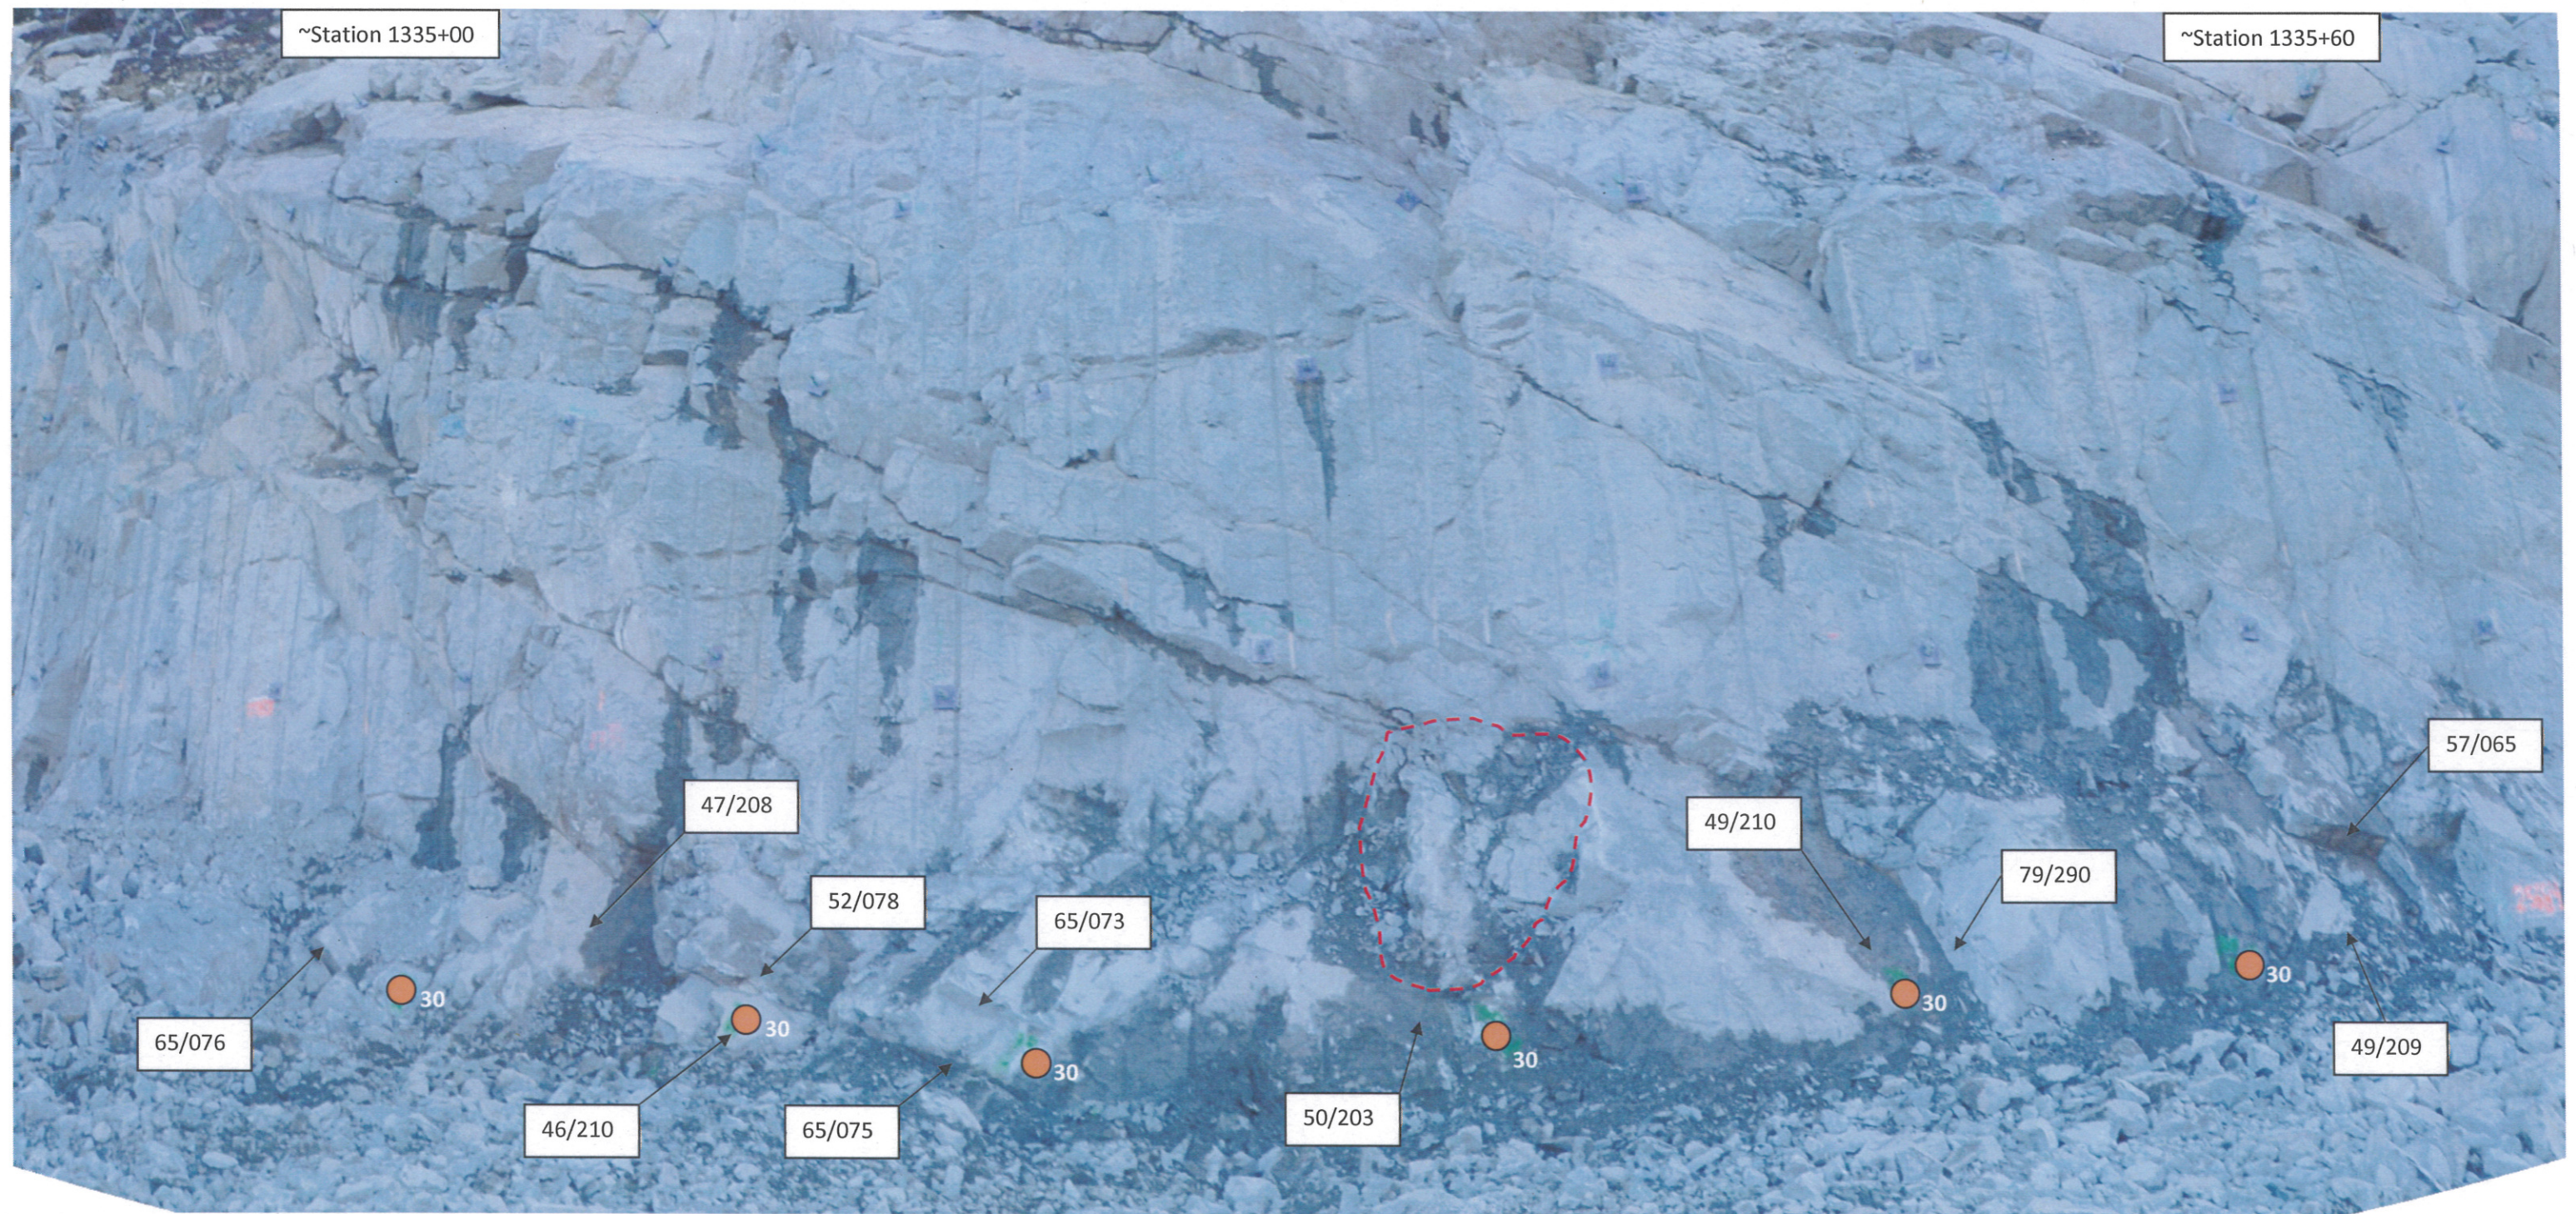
A photograph showing the lift inspection from approximate station 1335+00 to 1365+00 to approximate elevation 2568 MSL.
